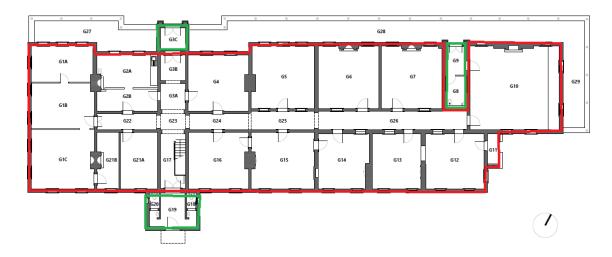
Architectural scope of works, with rooms to have subsurface reduction indicated in red and rooms with concrete floors and no impact in green. Source: Curio 2022 with markup
